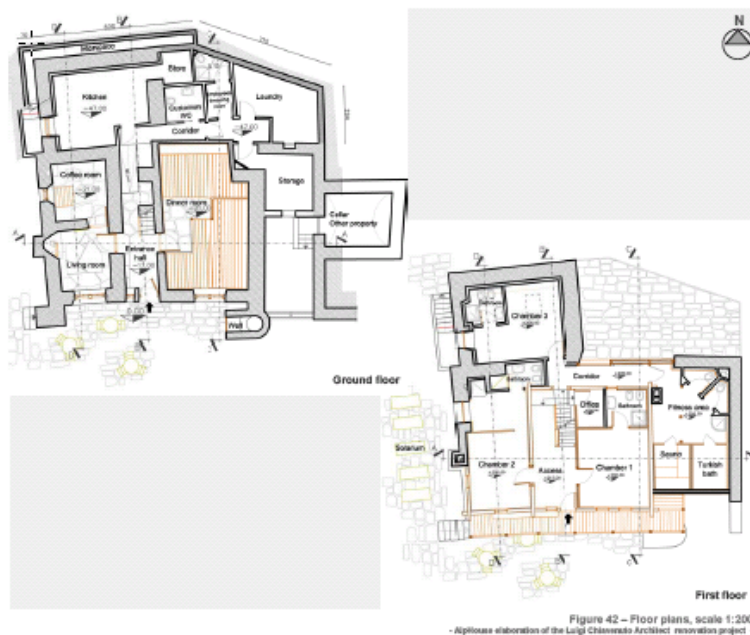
AlpHouse pilot-building Welf in Gressoney-La-Trinité, floor plans after renovation, by Arch. Luigi Chiavenuto and COA Energia Finaosta for Regione Autonoma Valle d'Aosta
